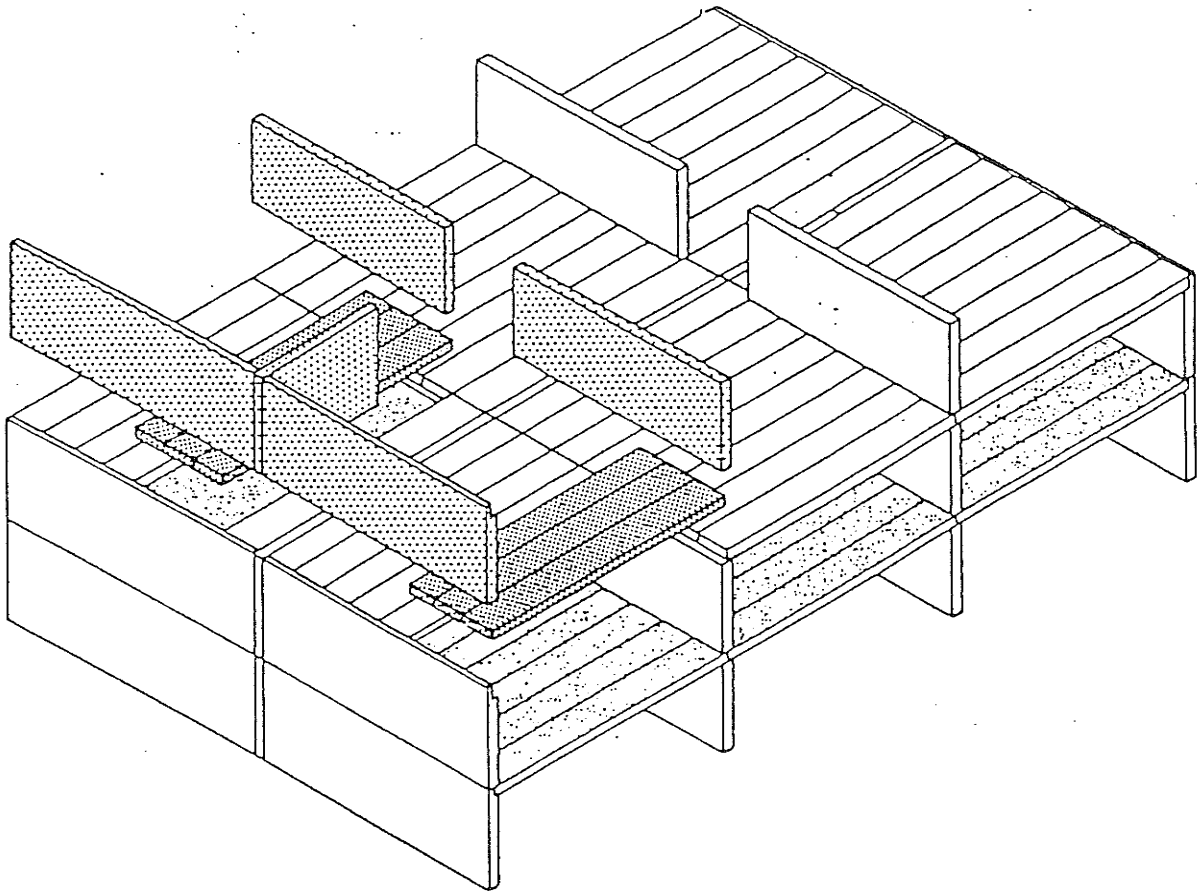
Load-bearing Shear Wall Panel System (Hanson (13))
